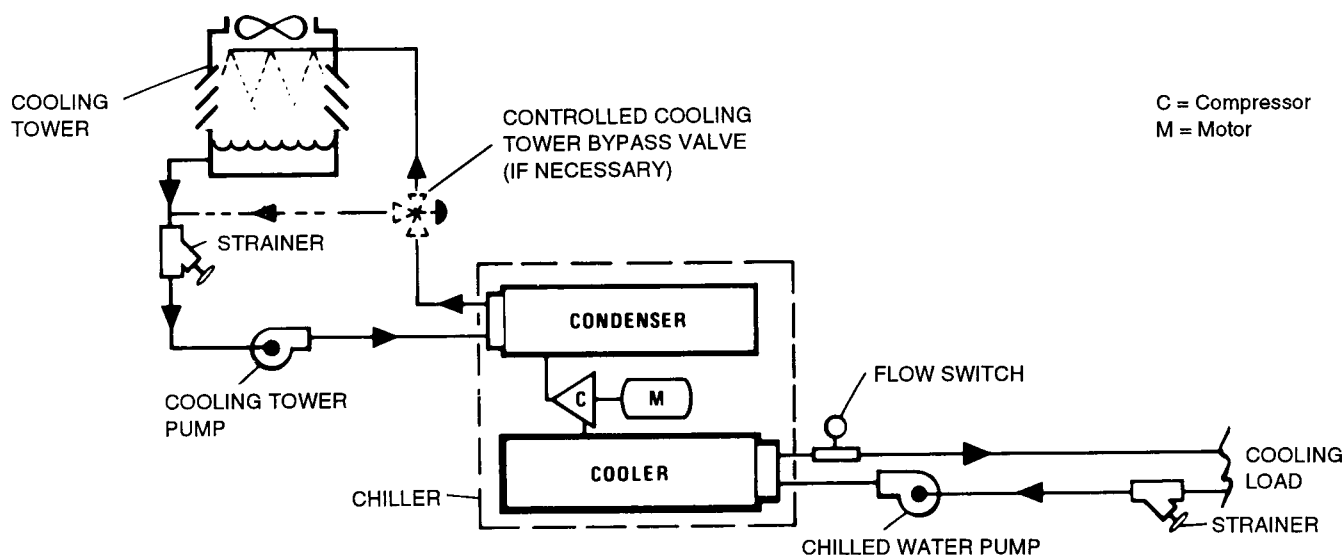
SCHEMATIC OF A TYPICAL PIPING ARRANGEMENT
